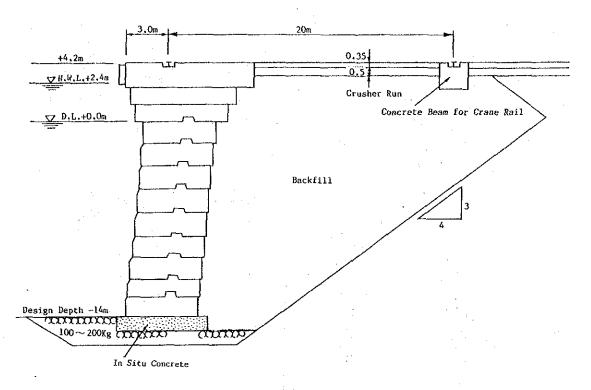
Proposed Cross Section of the Berth (-14m)
